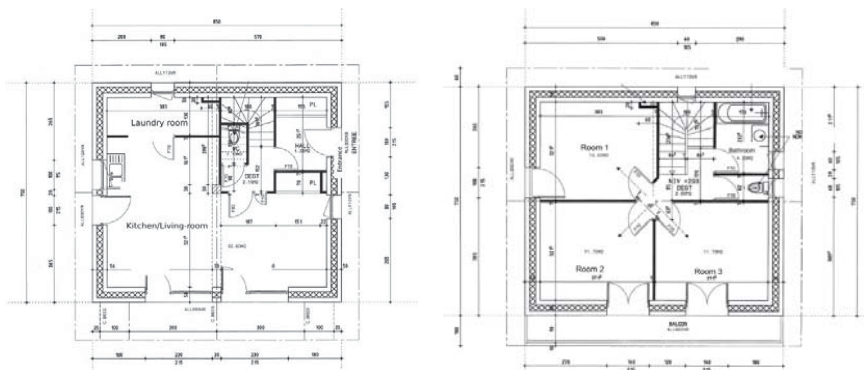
Plans of the INCAS house, ground floor (left) and first floor (right)
